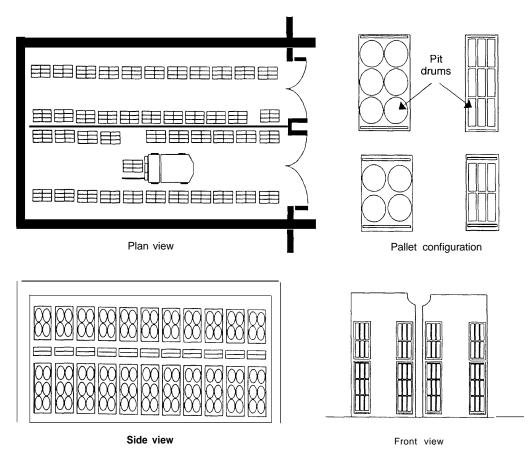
Multiple Stacking Configuration Proposed for Plutonium Storage at Concrete Bunkers
